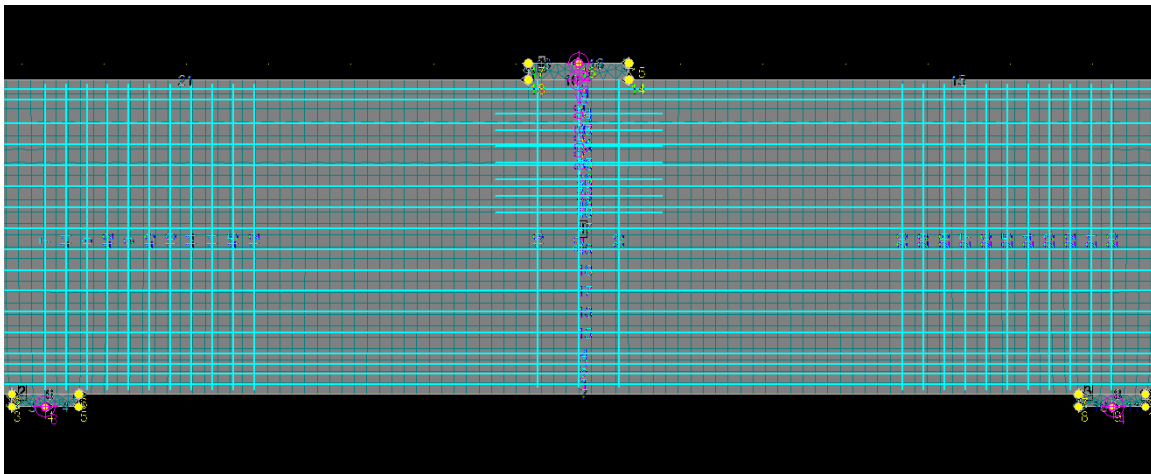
Deep beam with $a/d=1.85$ and vertical reinforcement placed close to support plates
